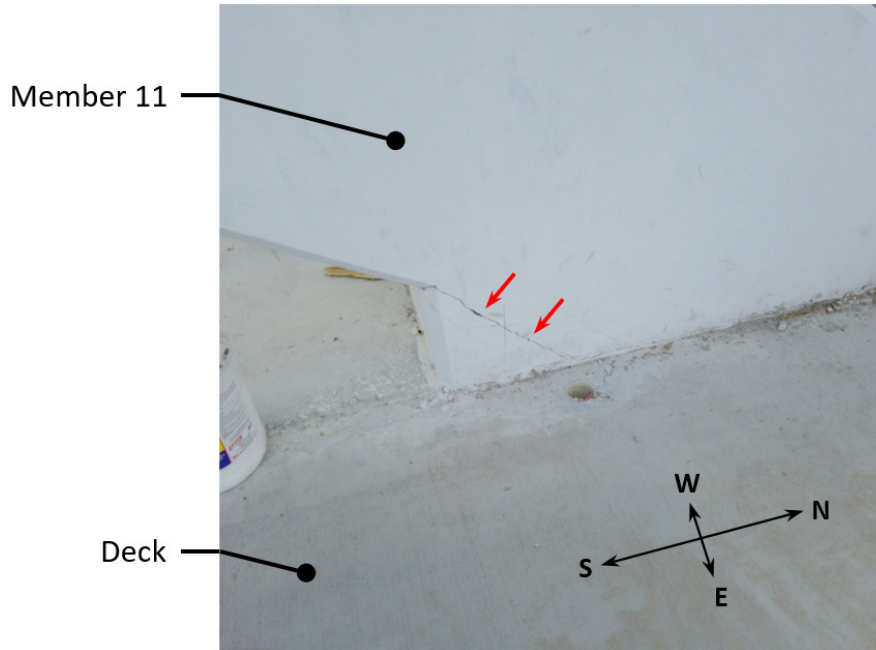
Photograph showing cracking at southeast corner of truss member 11 near where it met the deck. Captured on February 24, 2018 at 12:29 p.m. Corresponds to Bridge Factors Factual Report Photo 38.
